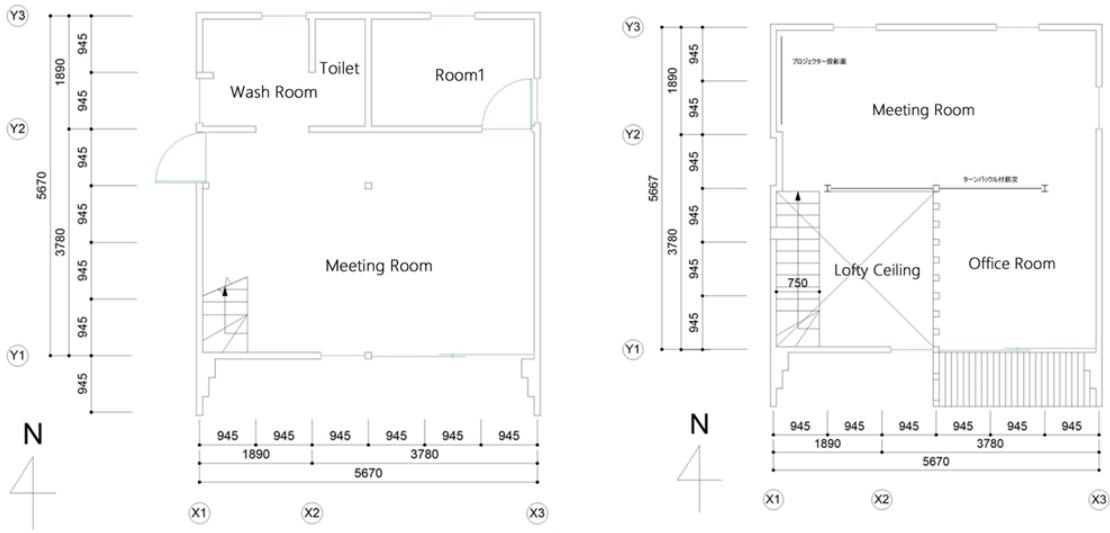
The two-story floor plan of the building: the first floor (left) and the second floor (right).
